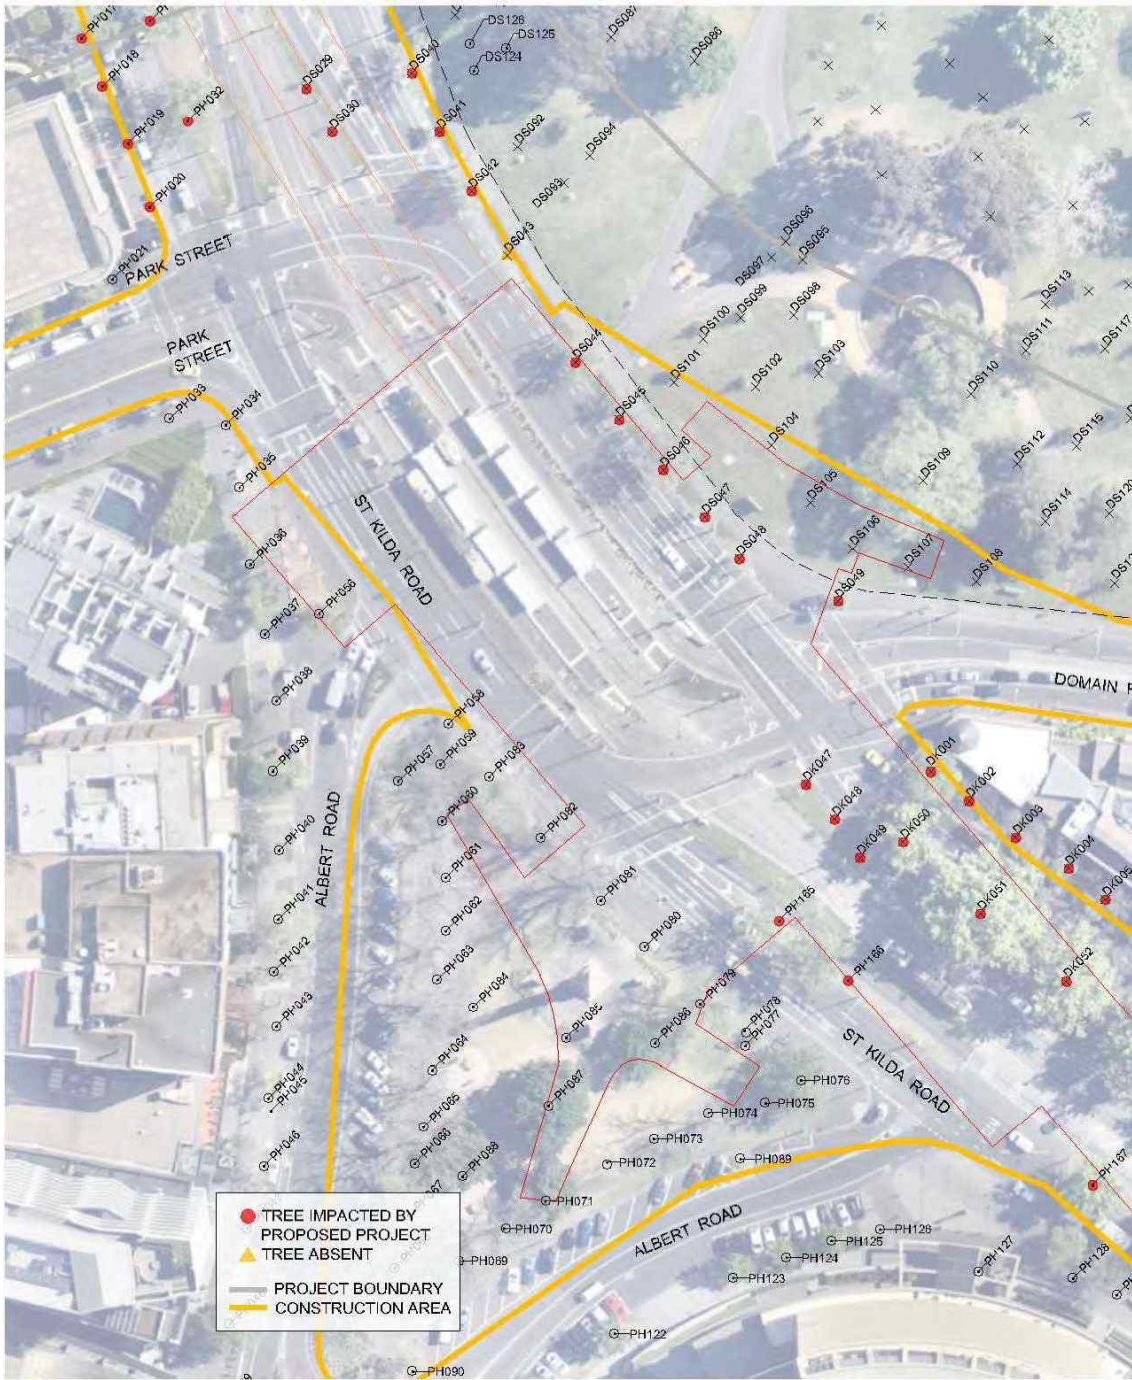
Proposed tree removals in St Kilda Road road reserve section 2
